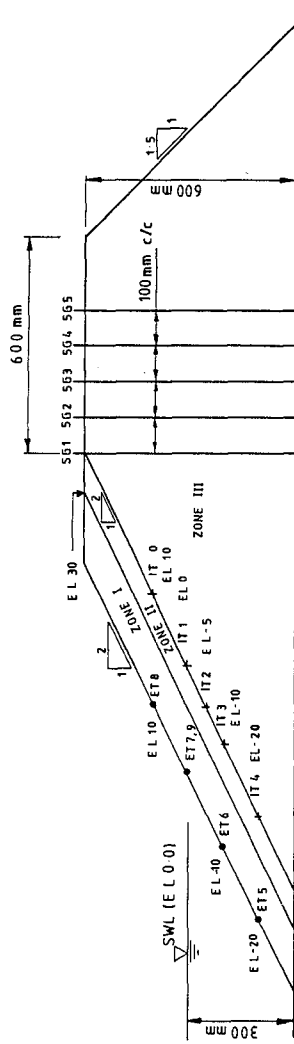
CROSS SECTION AND INSTRUMENT LAYOUT FOR BREAKWATER SLOPE 1:2
